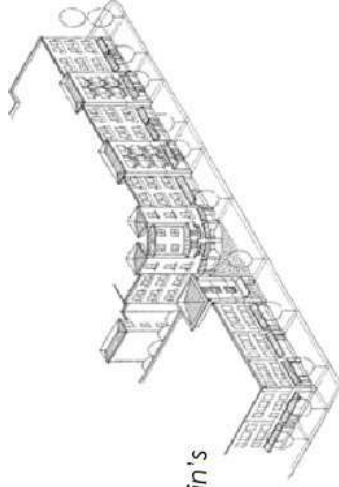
Potential larger development with wide sidewalks and pedestrian access that supports prominent civic entrances to buildings
